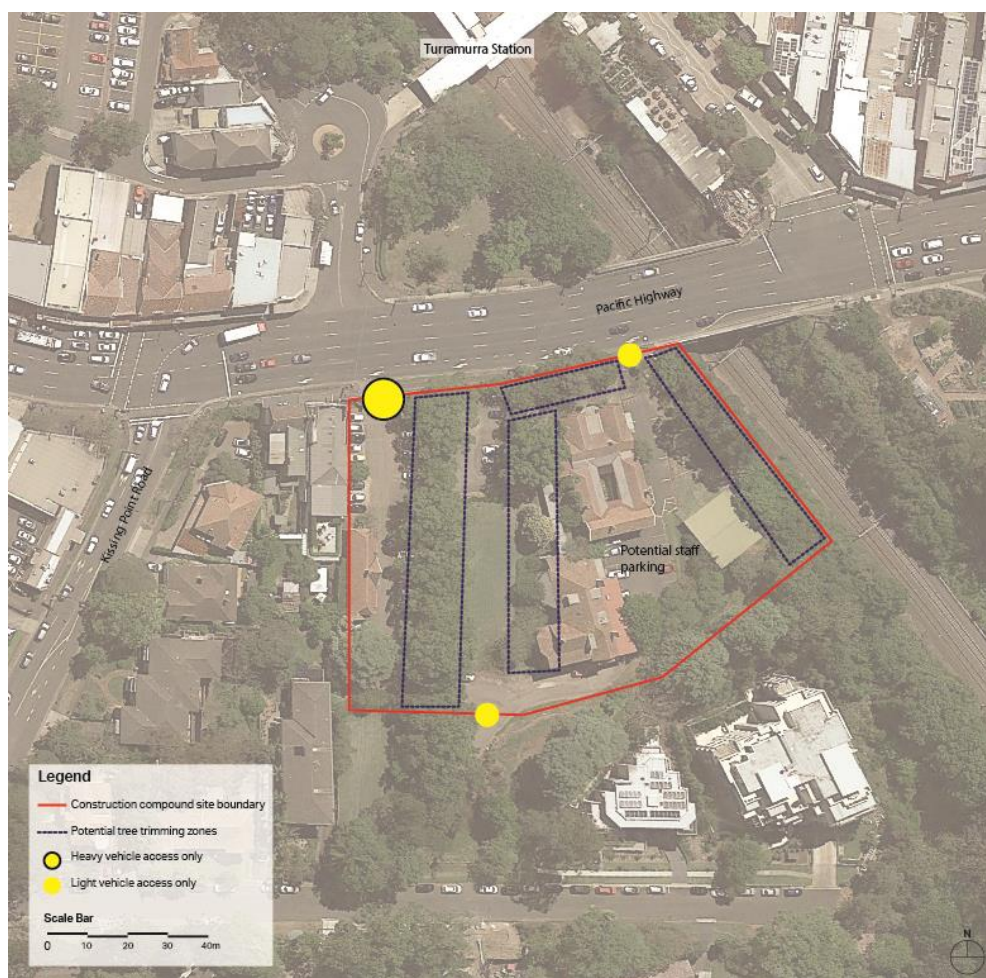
Proposed construction compound at 1334-1354 Pacific Highway, Turramurra. The main area for stockpiles, storage of machinery and site offices would be situated within the existing carpark to the west of the existing buildings on the property
